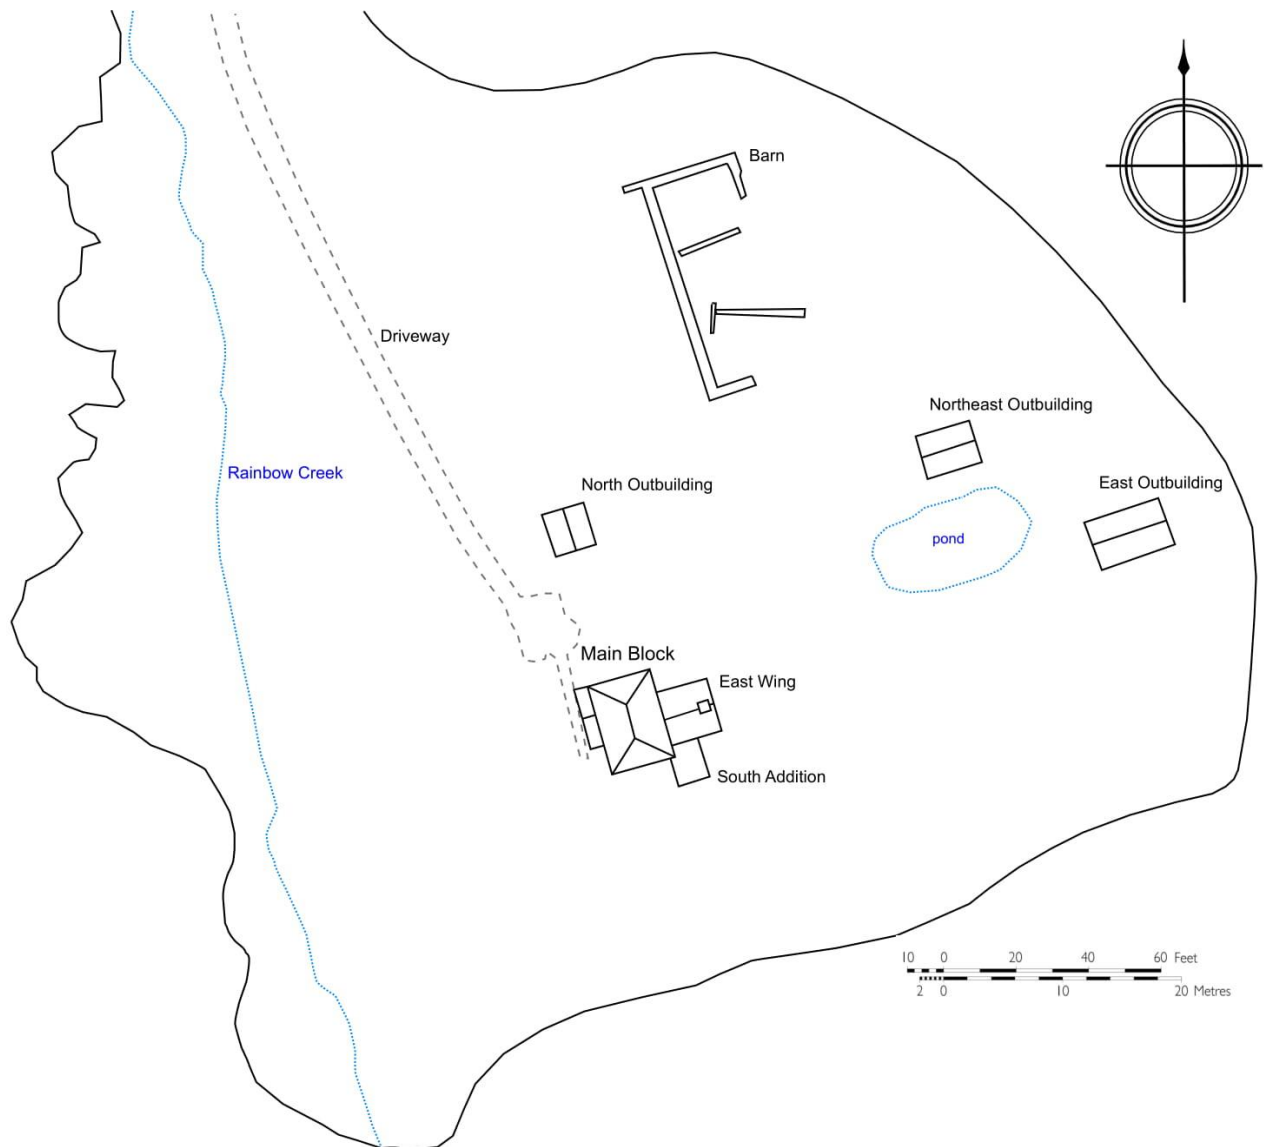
Schematic key plan for built elements in the central-west portion of the property.
